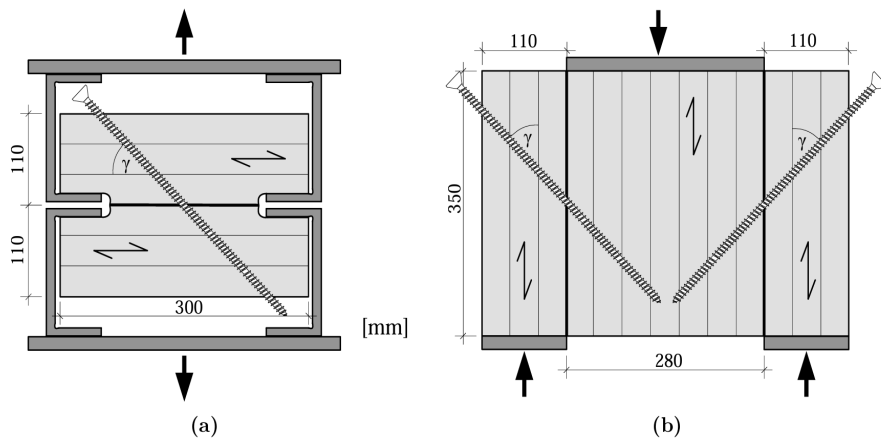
Experimental tests performed by Jockwer et al. [38]: pulling test (a), and shearing test (b) [38, p. 5].
